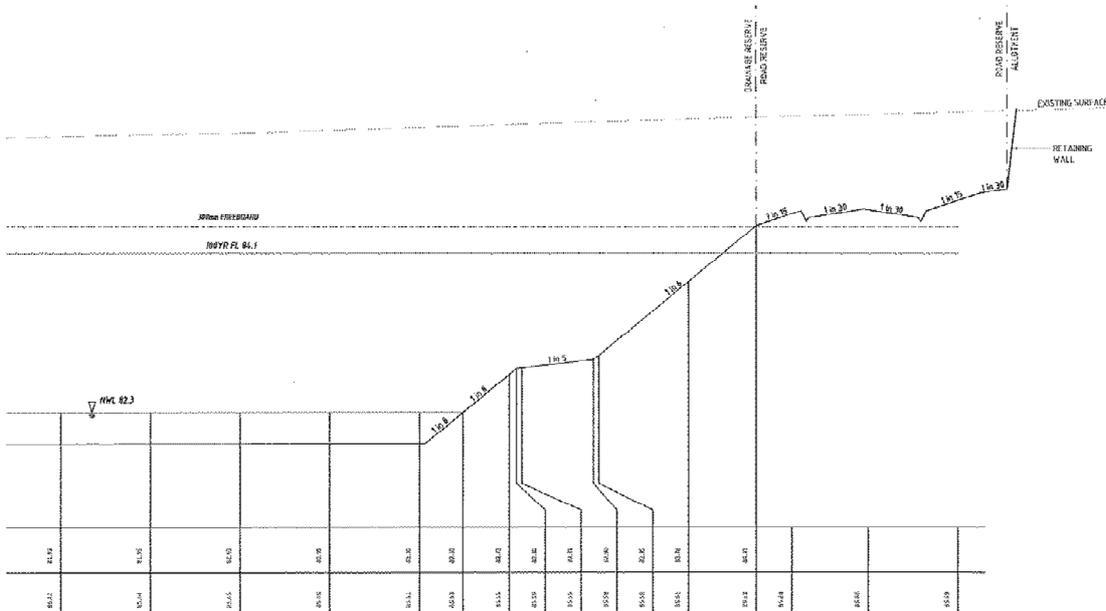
Typical cross section through WI24 reserve (including retaining wall in residential allotment)
